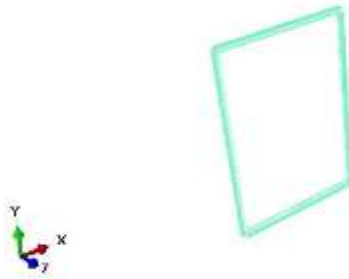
3 : Stirrup model as 1D truss element (T3D2)
